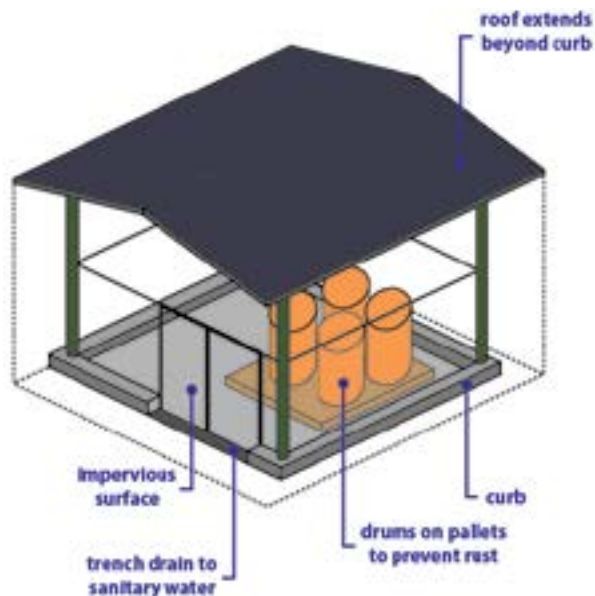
Example of Source Control Design for Outdoor Material Storage
